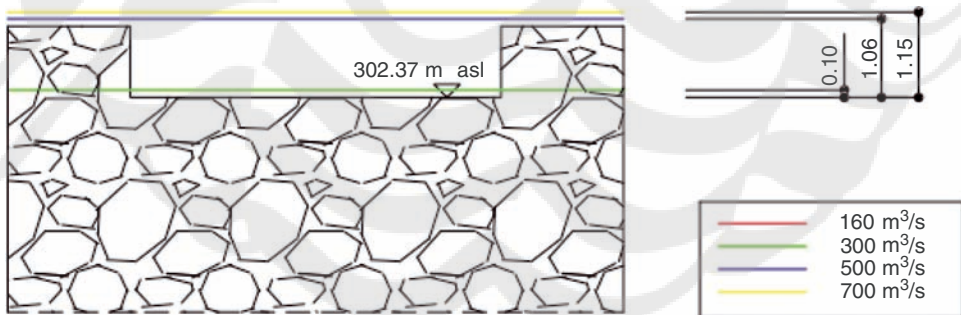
Opening section and water levels at Eiffel Bridge
